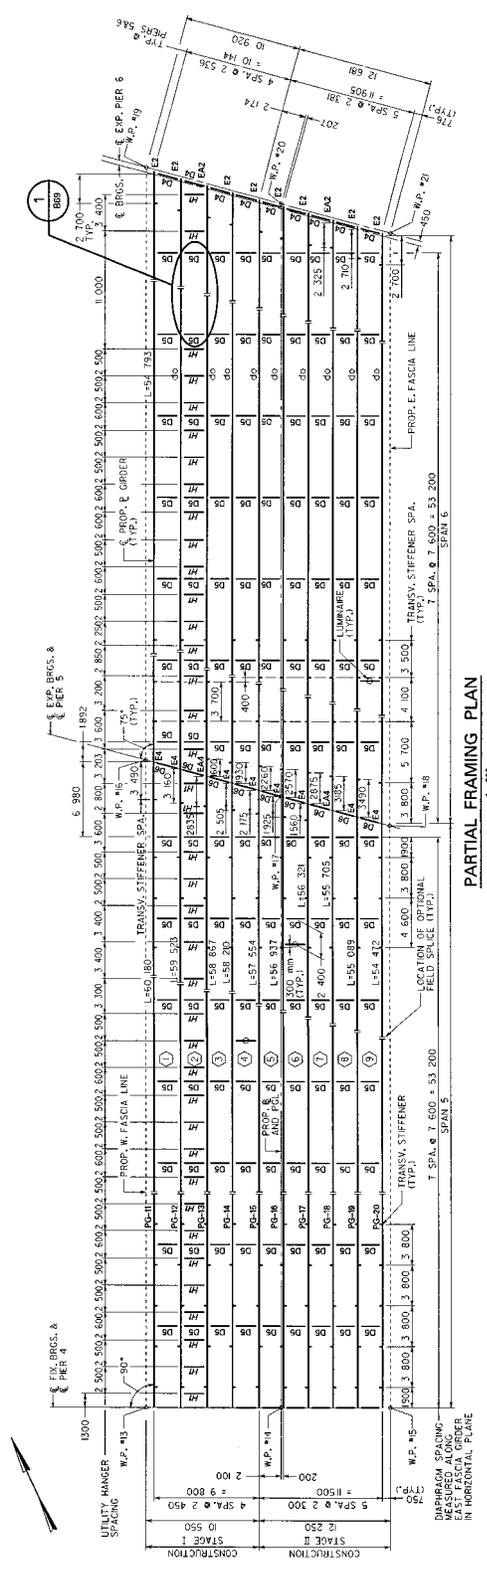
Partial Framing Plan Spans 5 and 6
